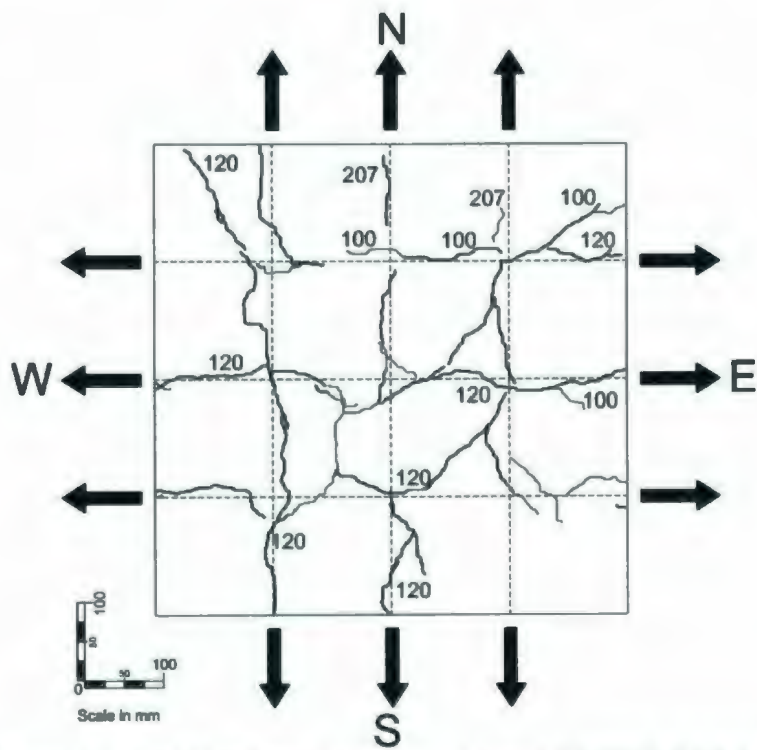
Stabilized crack pattern of panel P3-GNB-16-1.0-2.5
